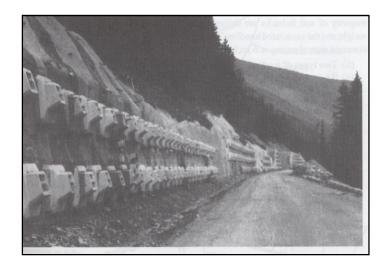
Tieback reinforcement for construction of railroad (Source: Abramson et al. 2002)
